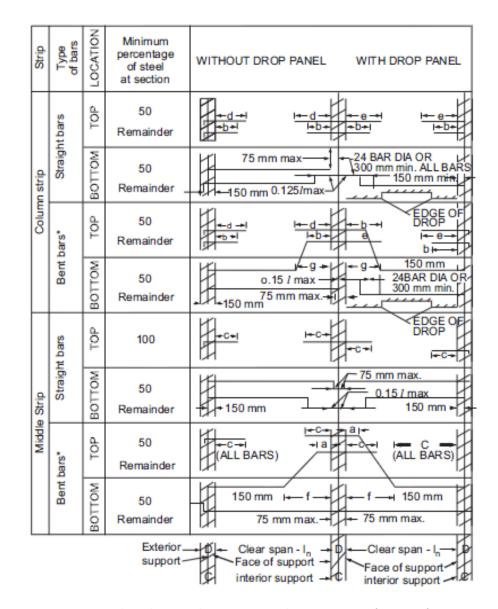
Minimum bend joint locations and extensions for reinforcement in flat slabs
